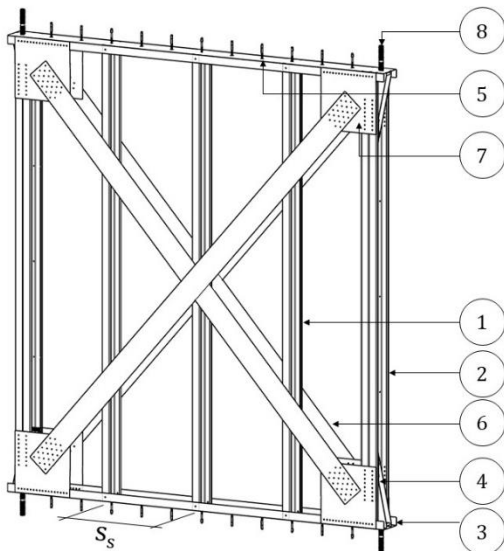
CFS strap braced wall: 1. stud; 2. chord stud; 3. track; 4. hold-down; 5. shear anchorage; 6. steel strap brace; 7. connection of strap brace; 8. tension anchorage; s_s : stud spacing.
